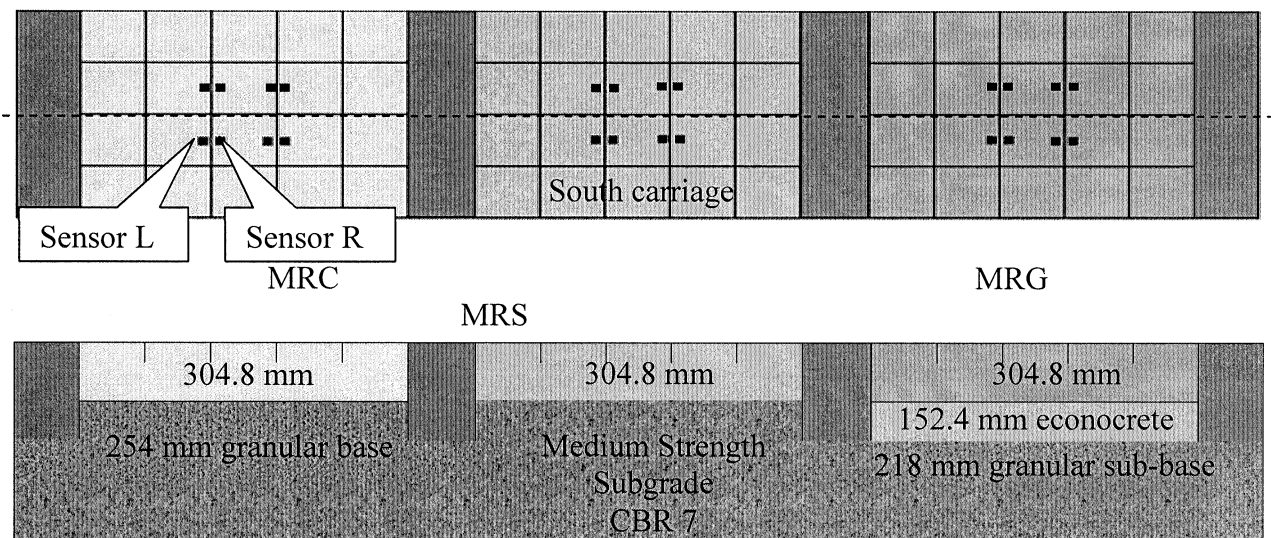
Plan and sectional view of CC2 test items along with position of concrete strain gages used in this study.
